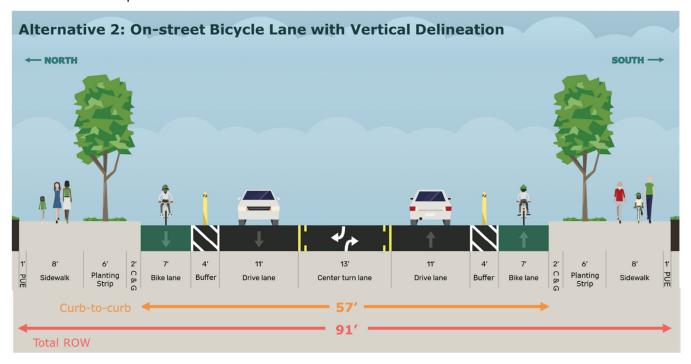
FARMINGTON ROAD CORRIDOR - ALTERNATIVE 2: 3-LANE CROSS-SECTION WITH VERTICAL DELINEATION (BLTS= 1, PLTS= 1)
